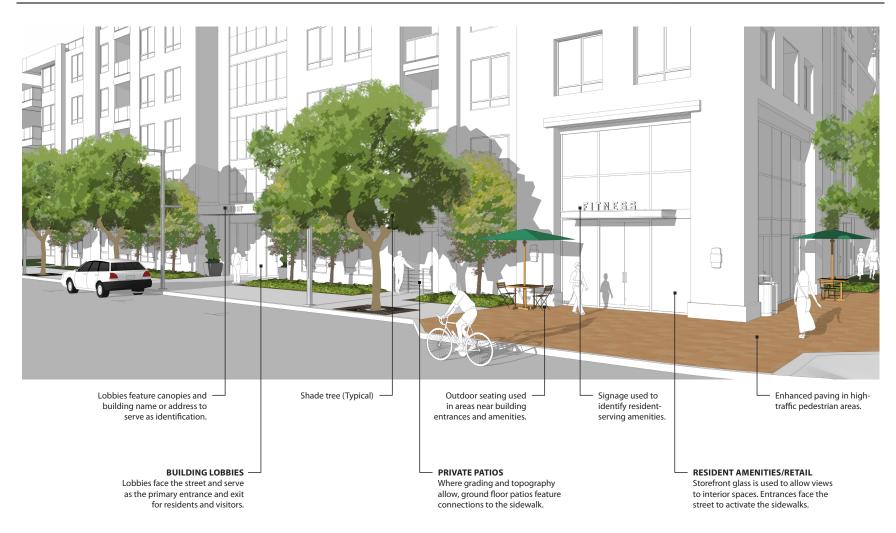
Riverwalk Specific Plan Retail Activation Interface
